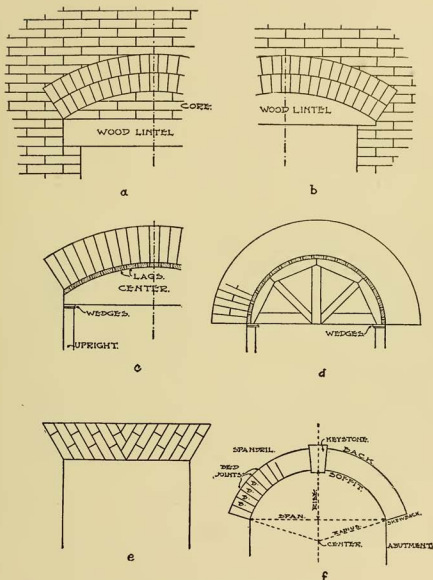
CONSTRUCTION OF BRICK ARCHES.
